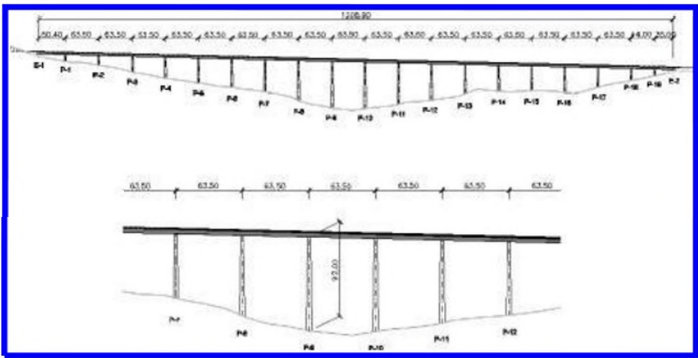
Bridge over Arroyo Las Piedras. From view of central zone.
